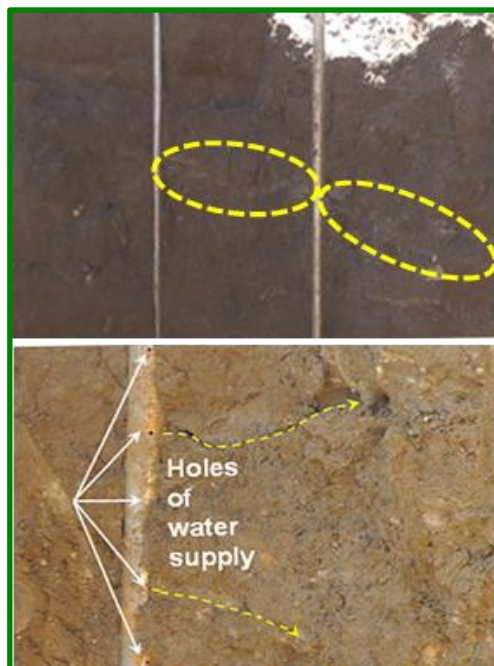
Aspects of cross-section after dismantling of full scale embankment.
